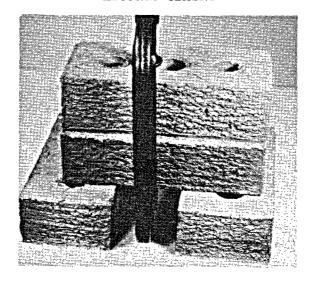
Completed sandwich showing "C" clamp and tooled mortar joint.
